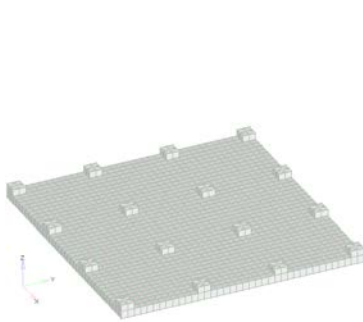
Foundation of a 9mx9m 3x3 bay structure.
